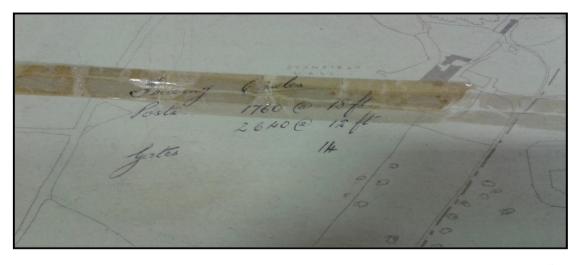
Plan for fencing at the technical site and bomb dump at Hethel airfield.⁵⁰
